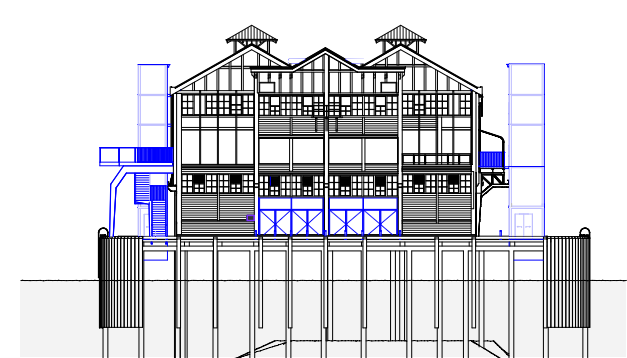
Proposed north elevation Wharf 4/5, (alterations shown in blue).
